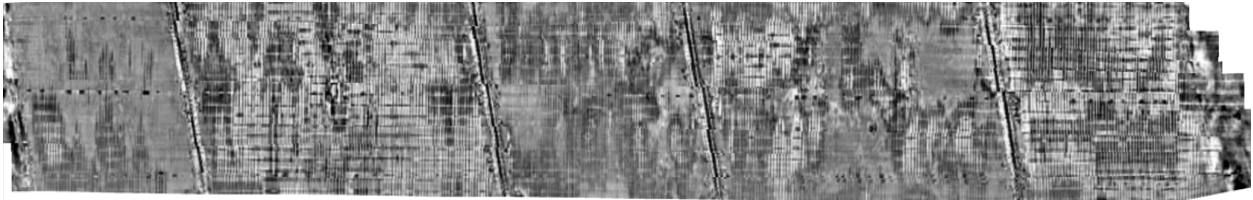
GPR Image Showing Top Steel Condition of Bridge Deck No. 22387
